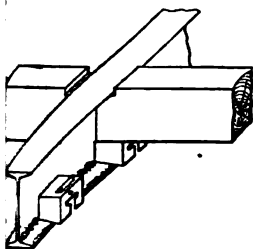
Duplex I-beam Box Hanger. Joists Raised More than Four Inches
